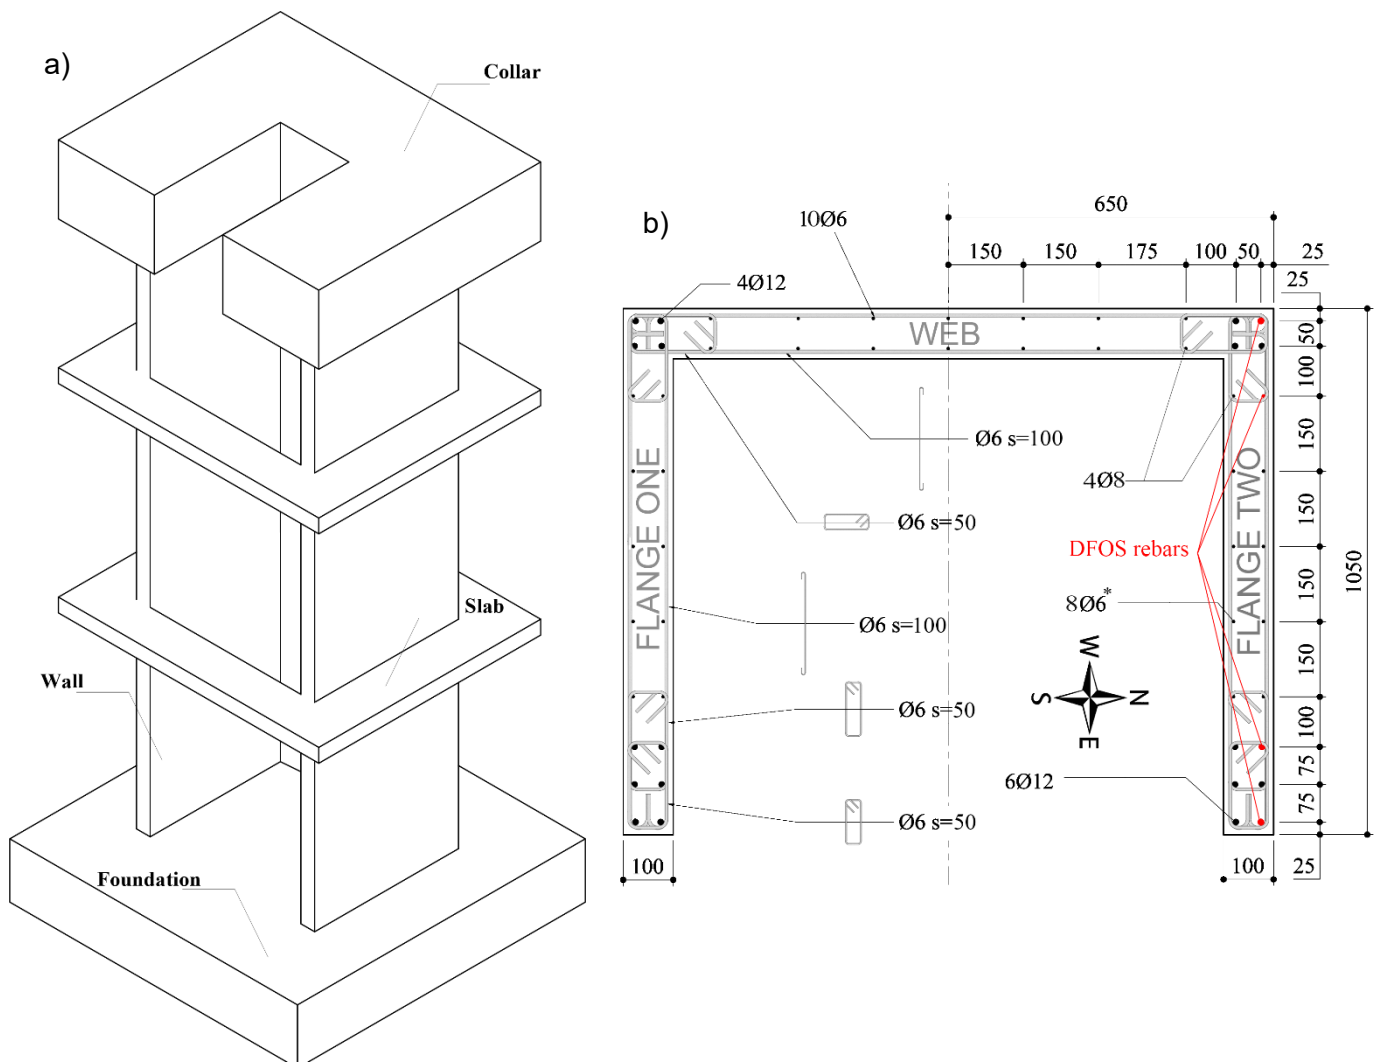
Unit UWS1 (a) three-dimensional elevation view and (b) cross-section and reinforcement detailing; the proposed instrumented steel reinforcing bars with distributed fibre-optic sensors are denoted “DFOS rebars”
